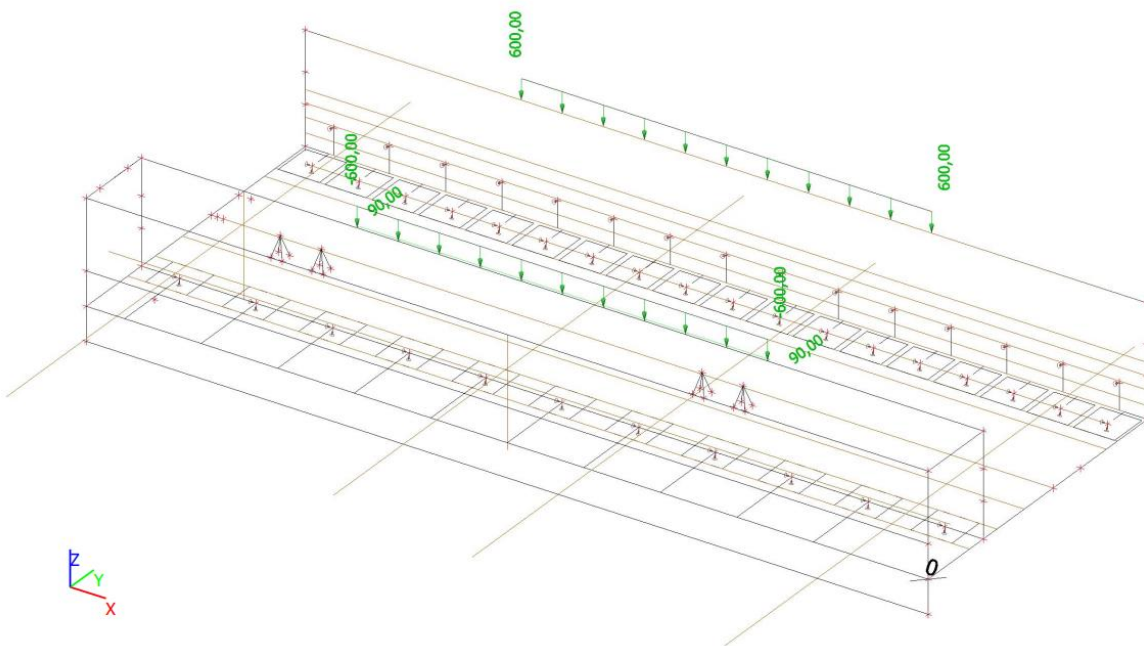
2.5D model: LC7-4- Crane load (waterside rail towards water)
